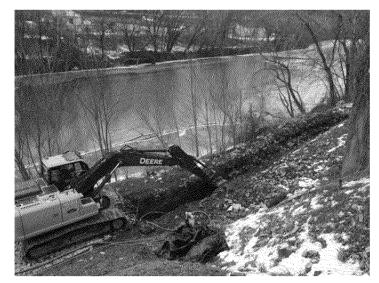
; Taken on 01/31/14 at 15:10 hours by START GN. New deeper trench excavation area.
